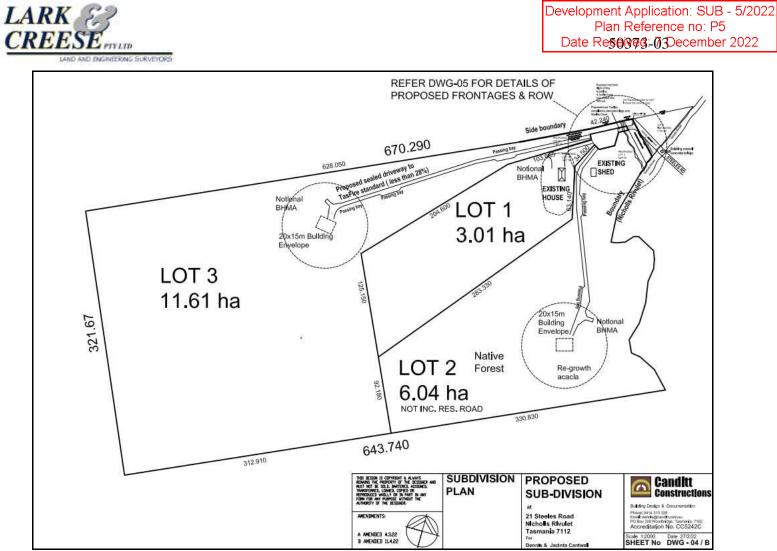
Site plan showing the proposed 3 Lot subdivision configuration for 21 Steels Road, Nicholls Rivulet.
